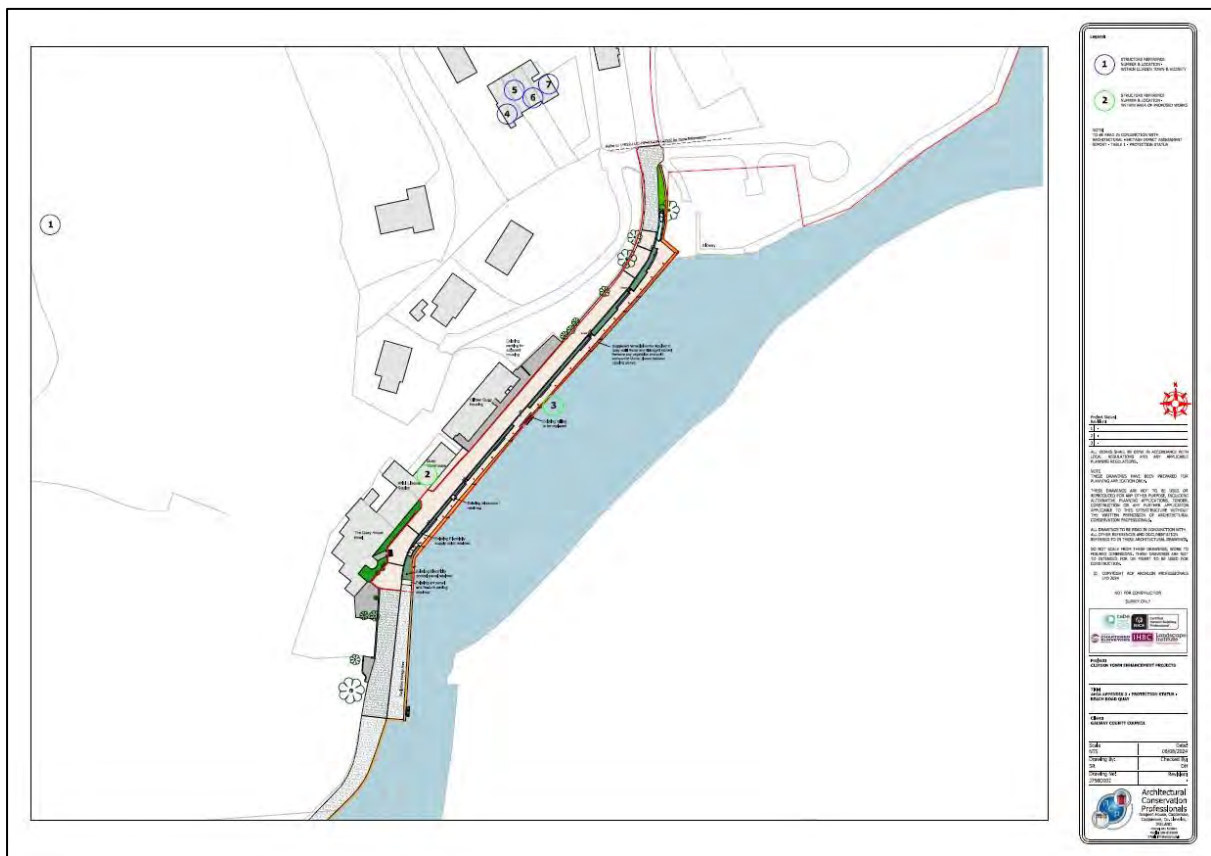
Appendix 2 - J758D002 Protection Status Beach Road Quay
